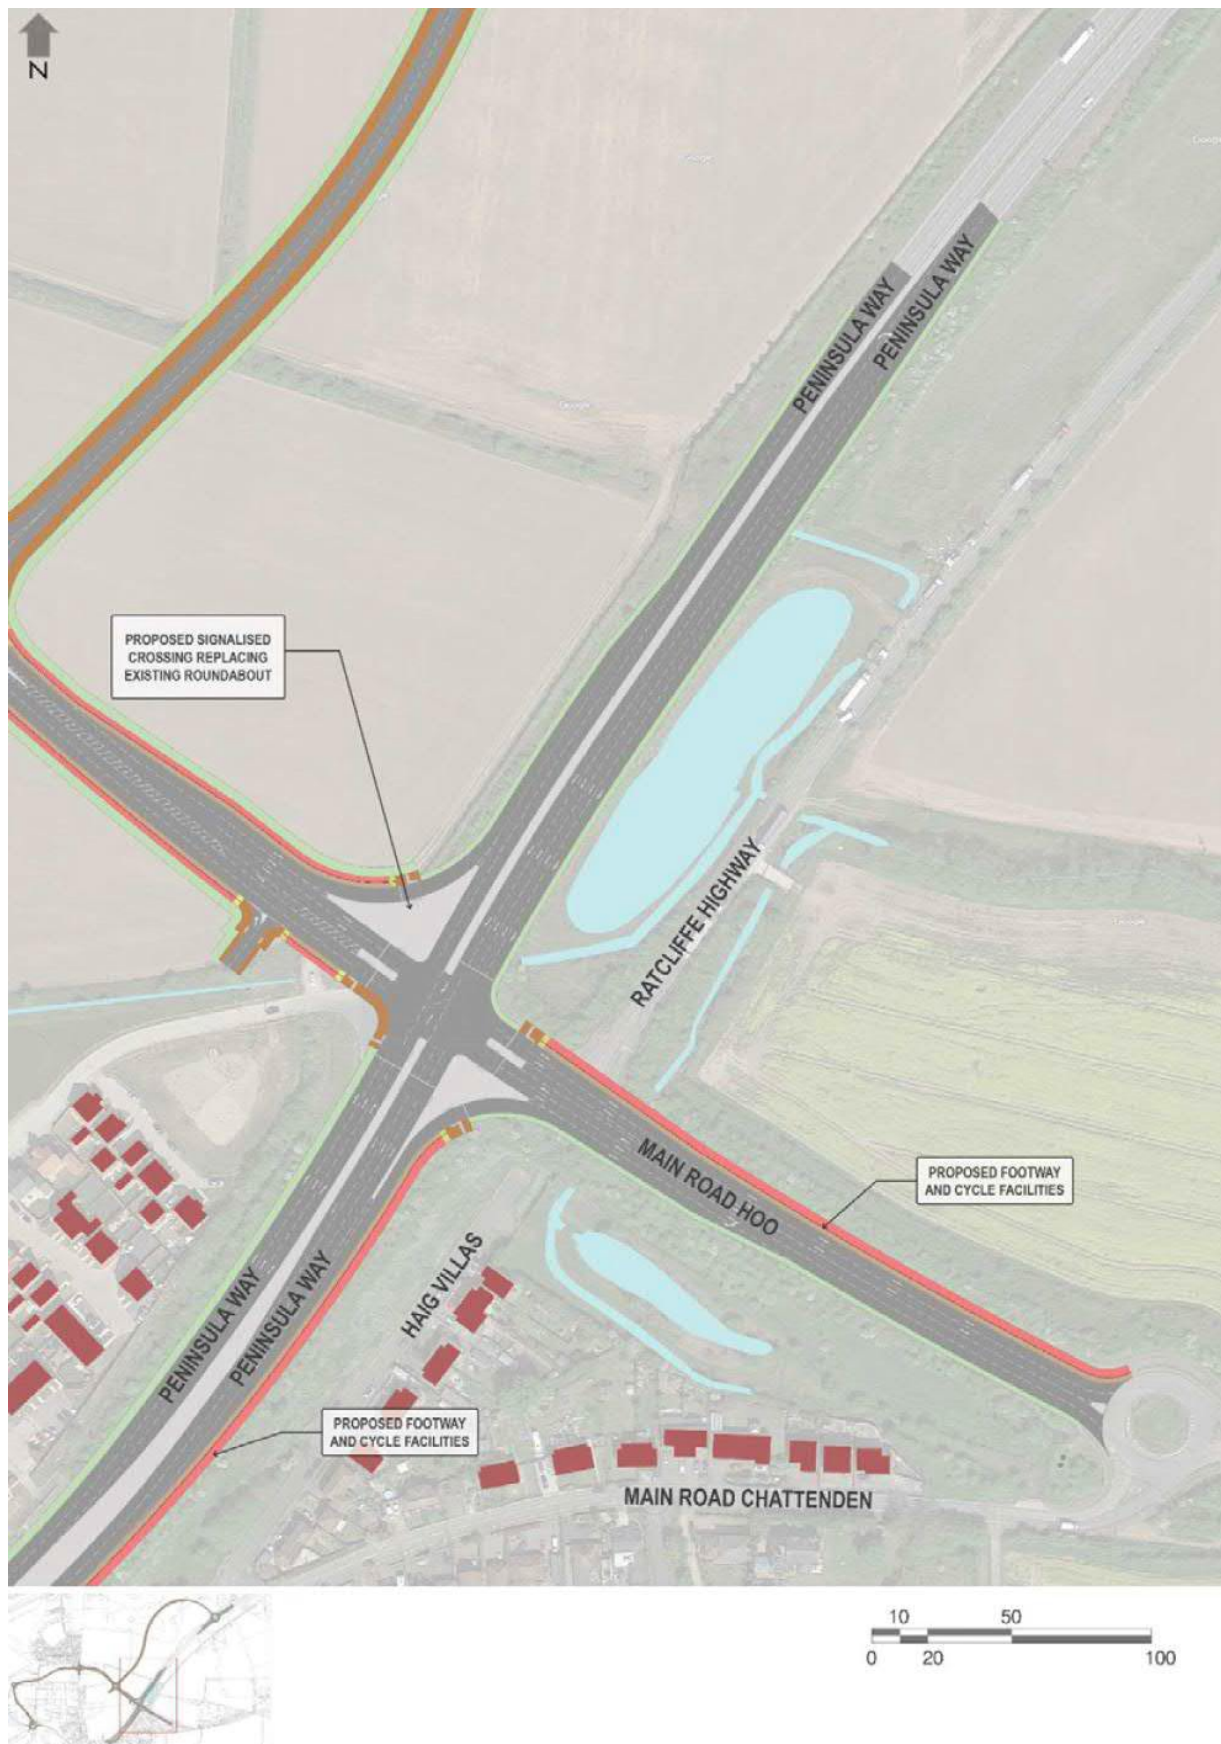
Phase 2 – Proposed A228/Main Road Roundabout junction modification
